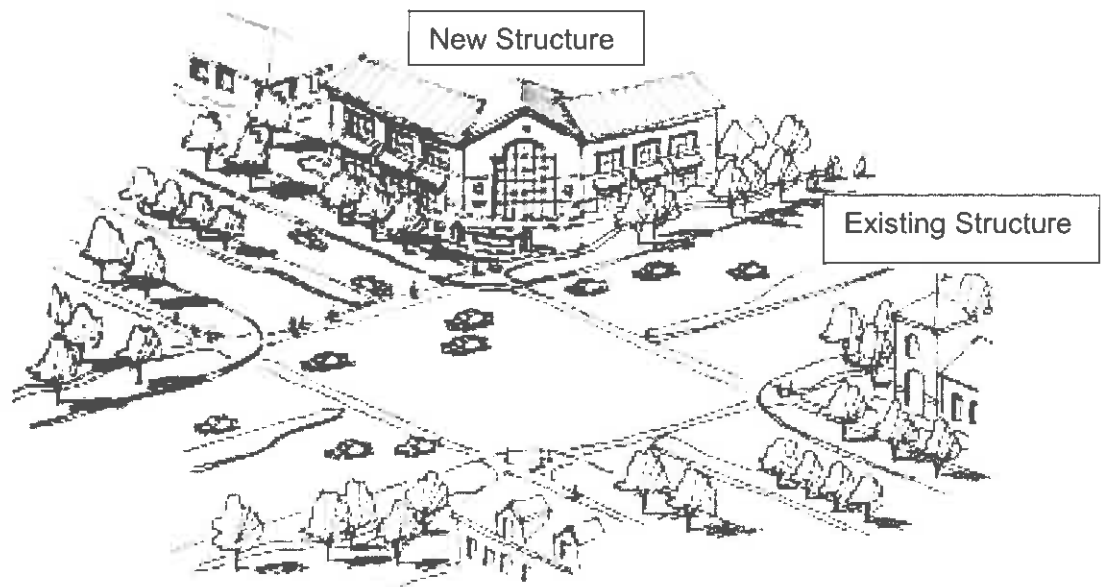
New buildings located along a street frontage should align building walls with existing buildings across the street to help create a consistent building edge, to the maximum extent feasible
